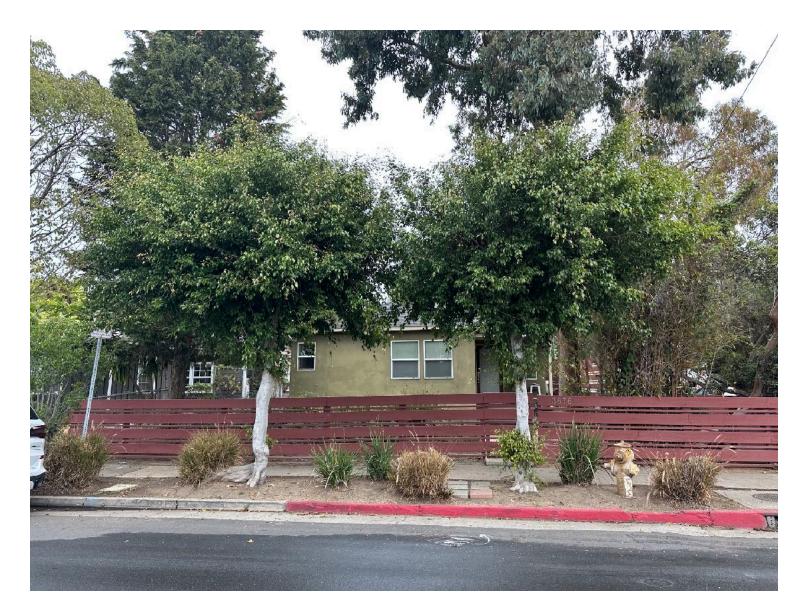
Kelton Ave has a dedication that will continue across the entire project site and will require the removal of two (2) City of Los Angeles Ficus Street Trees #20 and #2. Replacement to the satisfaction of the Urban Forestry Department.
